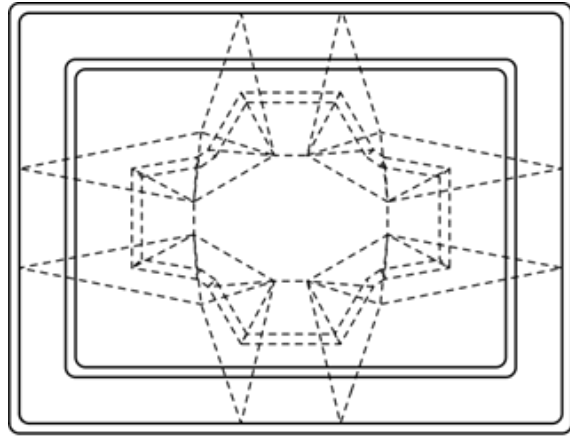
Plan Drawing of the white exposed concrete fountain located in the arcaded entrance of Faculty of Architecture. (Produced by the author)
